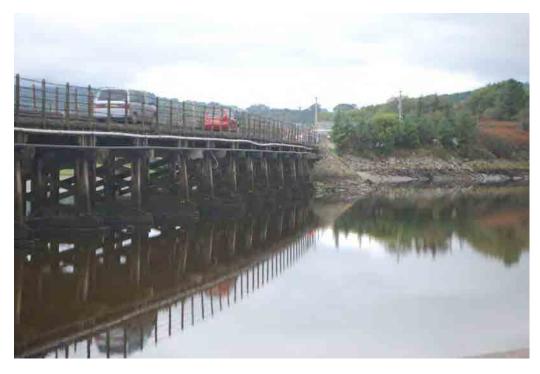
Pont Briwet at Traeth Bach level from the south south east showing wooden piers
